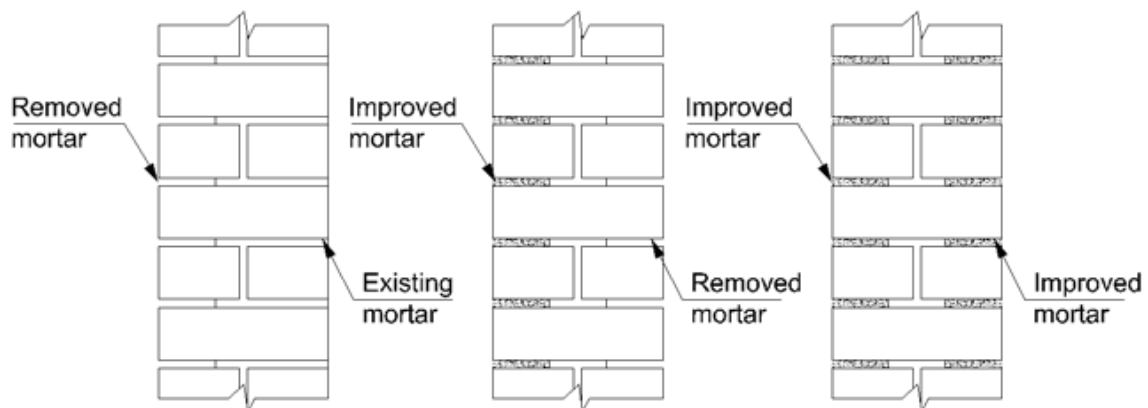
Repair and strengthening of brick masonry by repointing
